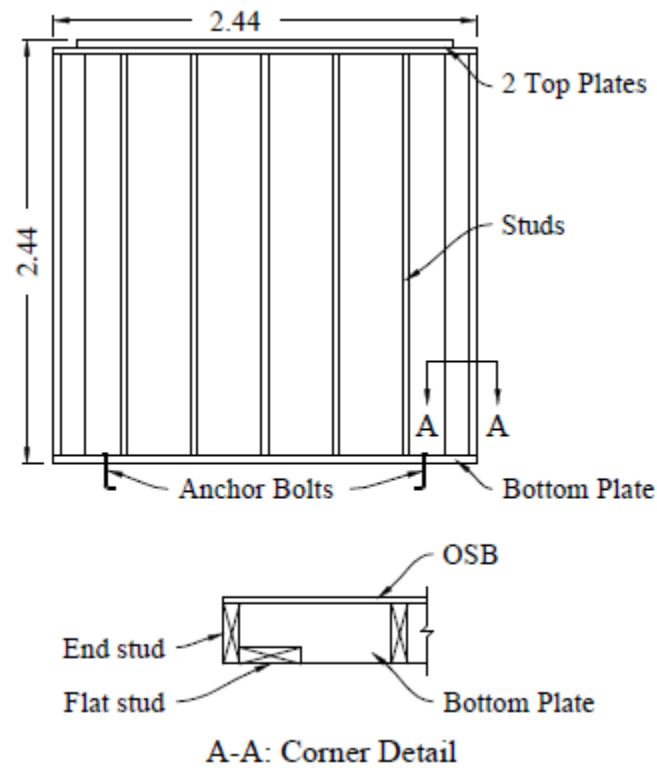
Out-of-plane wall (specimen 2) schematic (dimensions in meters)
